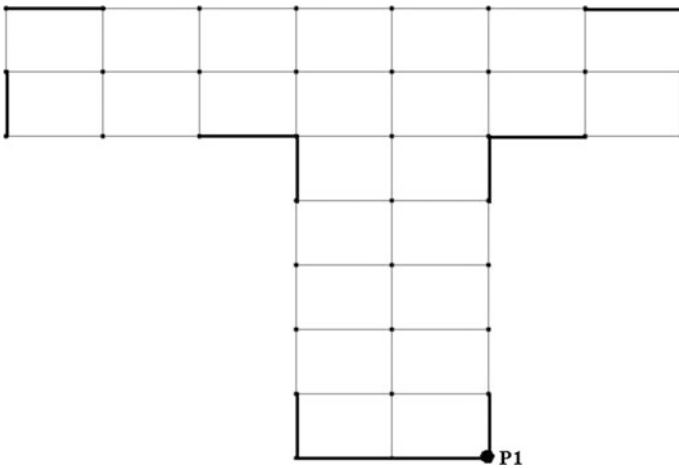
VED positions in PLAN for T shape building (7 bays of 6 m in X and 7 bays of 4 m in Y)
